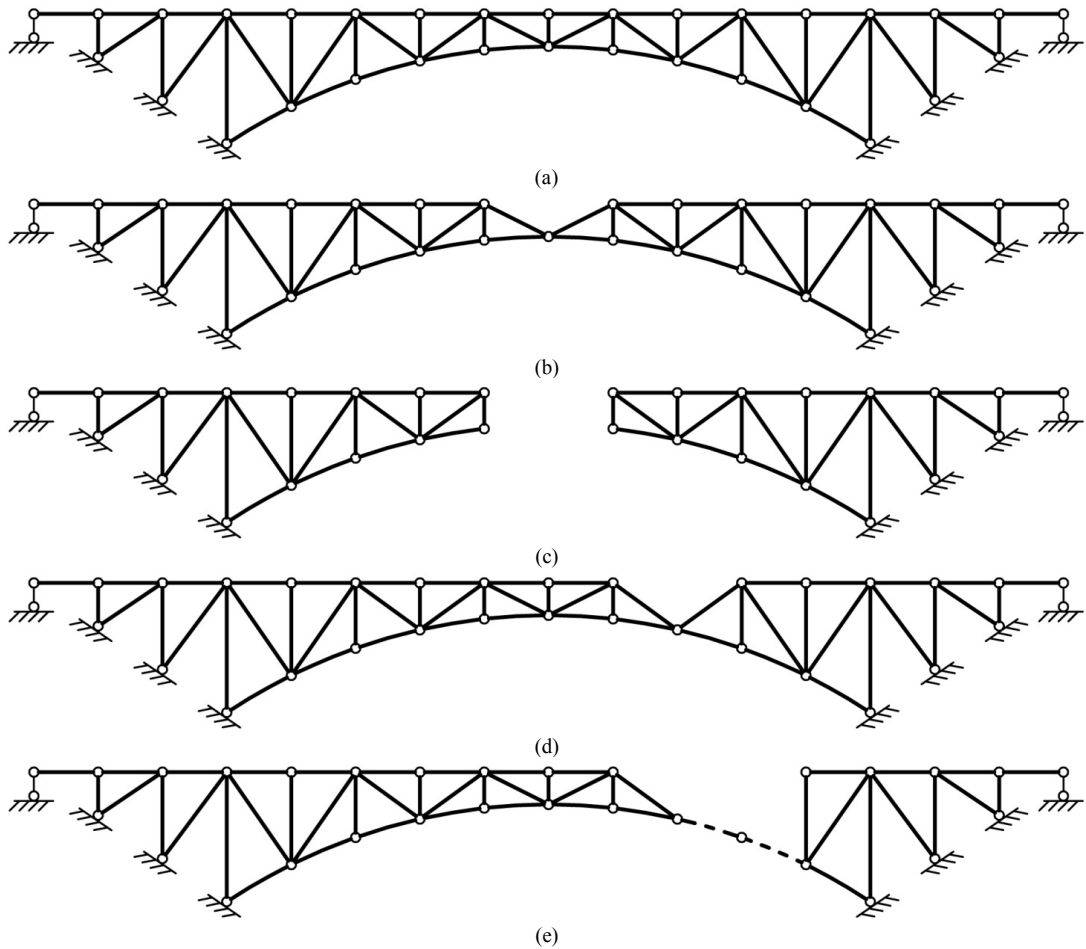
Truss bridge system: (a) initial; (b) destruction case 1; (c) destruction case 2; (d) destruction case 3; (e) destruction case 4
